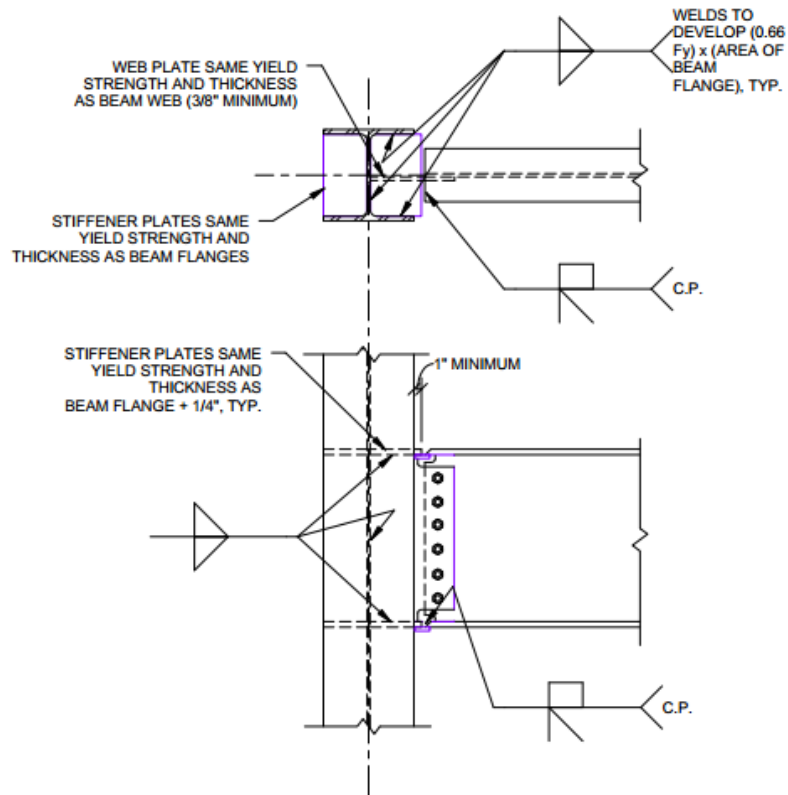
TYPICAL MOMENT CONNECTION TO COLUMN
